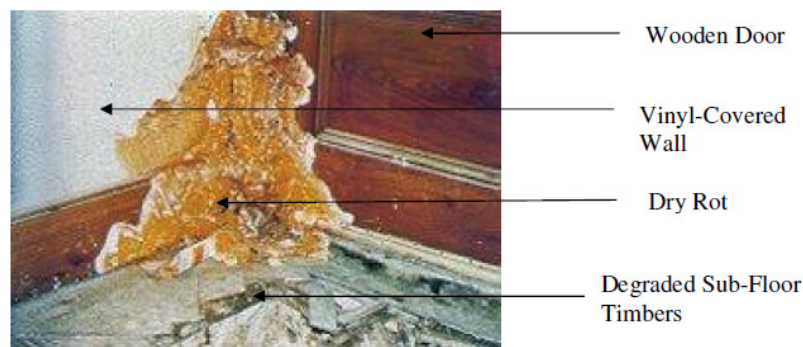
Dry rot formation in the sub-floor area of a building [55]
